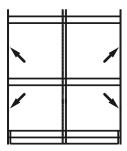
Additional fixing points of the frame for horizontal aiming and protection against rotation and swing
